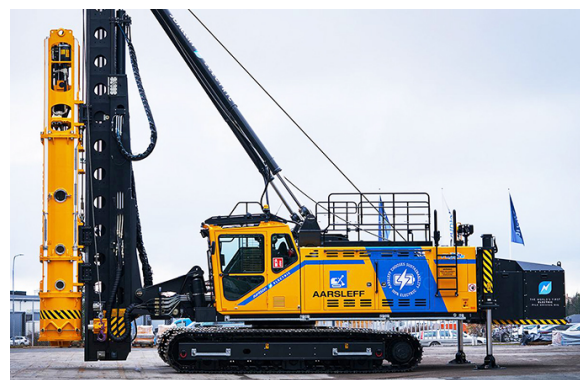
Smaller electric piling rig, Junttan PMx2e [39]
